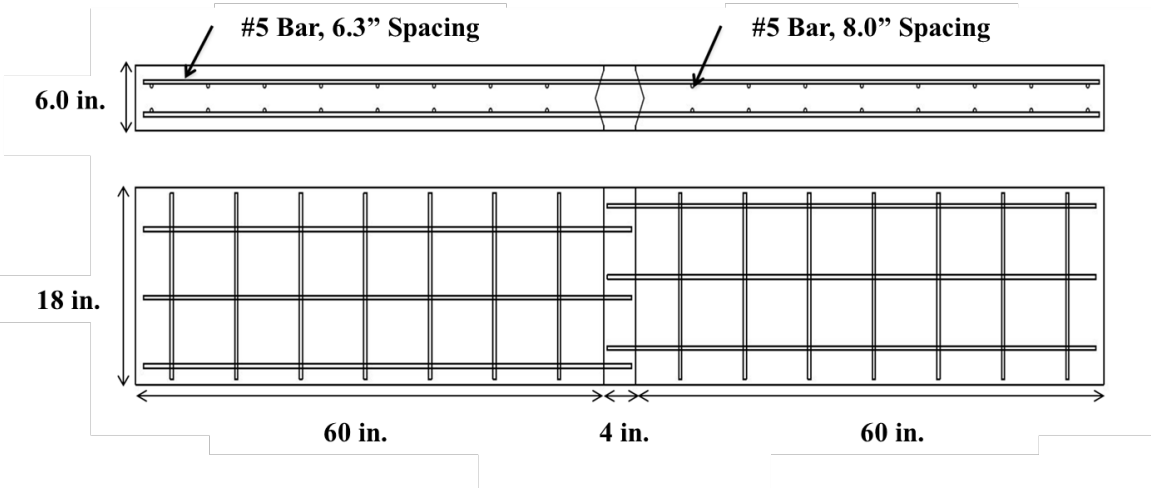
Construction and Reinforcement Details for Precast Decks with UHPC Joint
